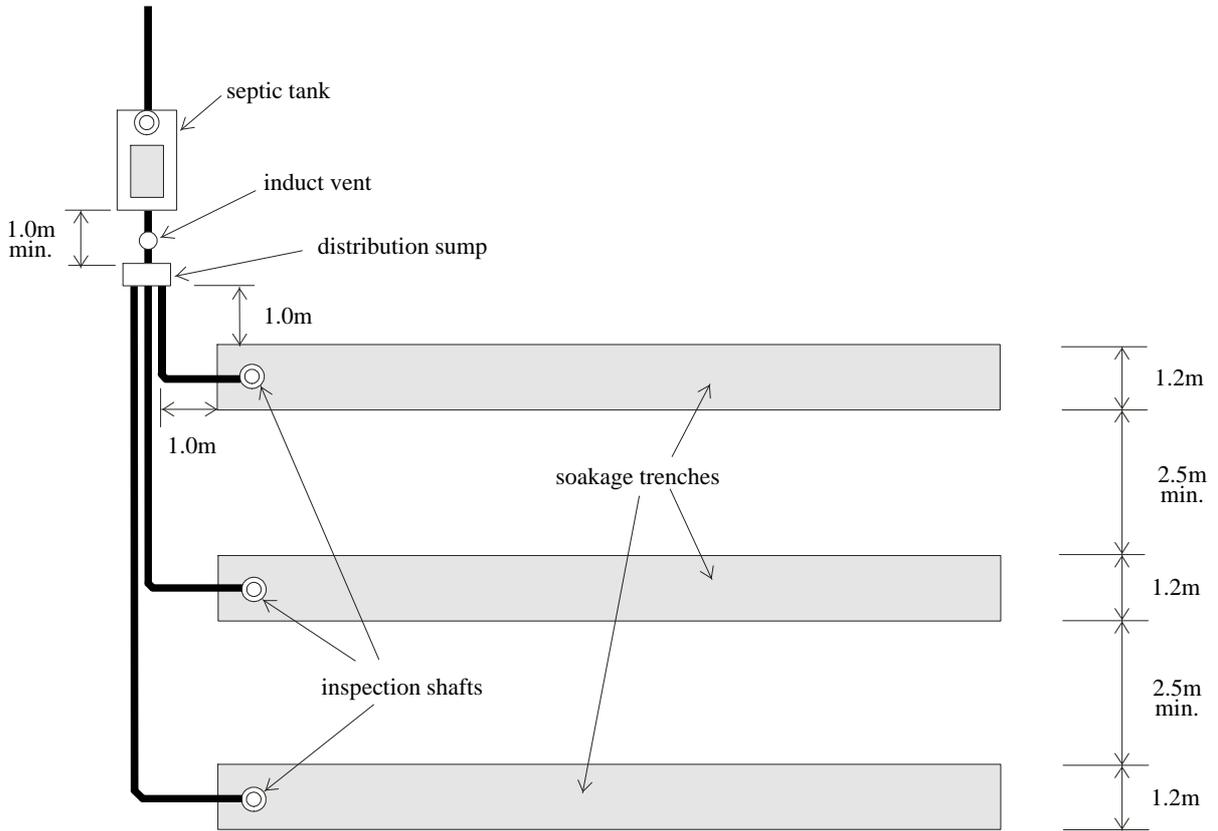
DISTRIBUTION SUMP / TRENCH LAYOUT
